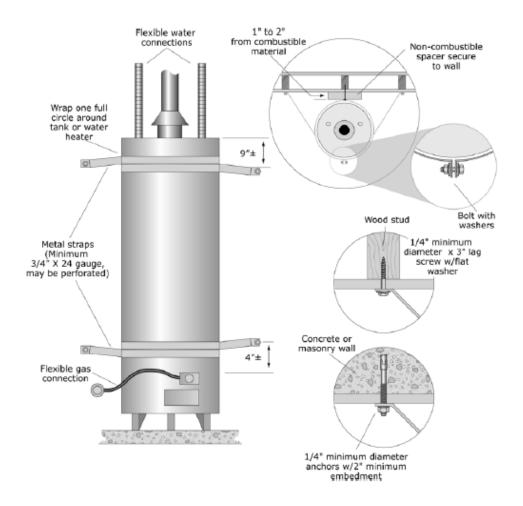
Water Heater Strapping to Backing Wall. (FEMA E-74, 2012, Reducing the Risks of Nonstructural Earthquake Damage)
